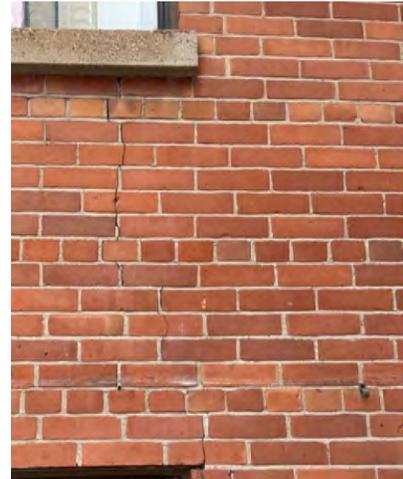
South elevation step cracking (ERA, 2022).
